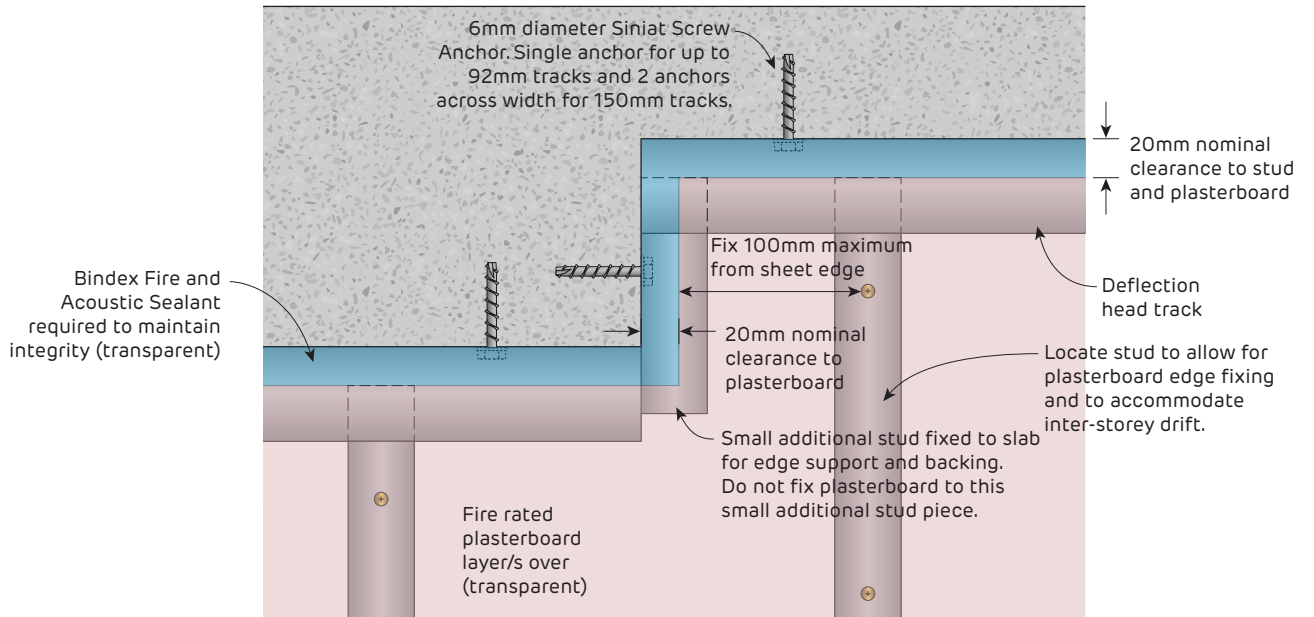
Step in Concrete Slab with 20mm allowance for Inter-Storey Drift
